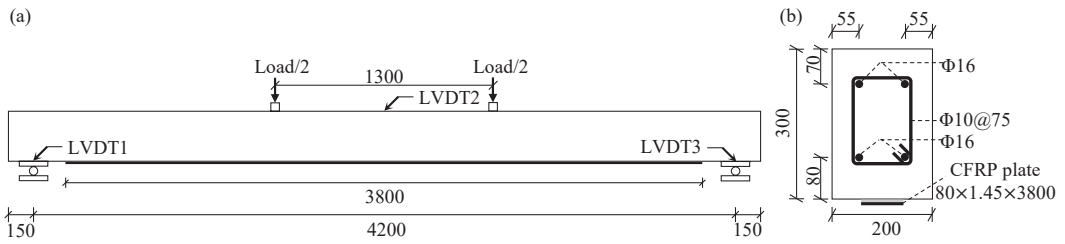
(a) Reinforced concrete (RC) beams subjected to four-point bending tests until failure (unit: mm); (b) cross-sectional dimension of the RC beams (with a carbon-reinforced polymer (CFRP) plate for the strengthened beam only).
